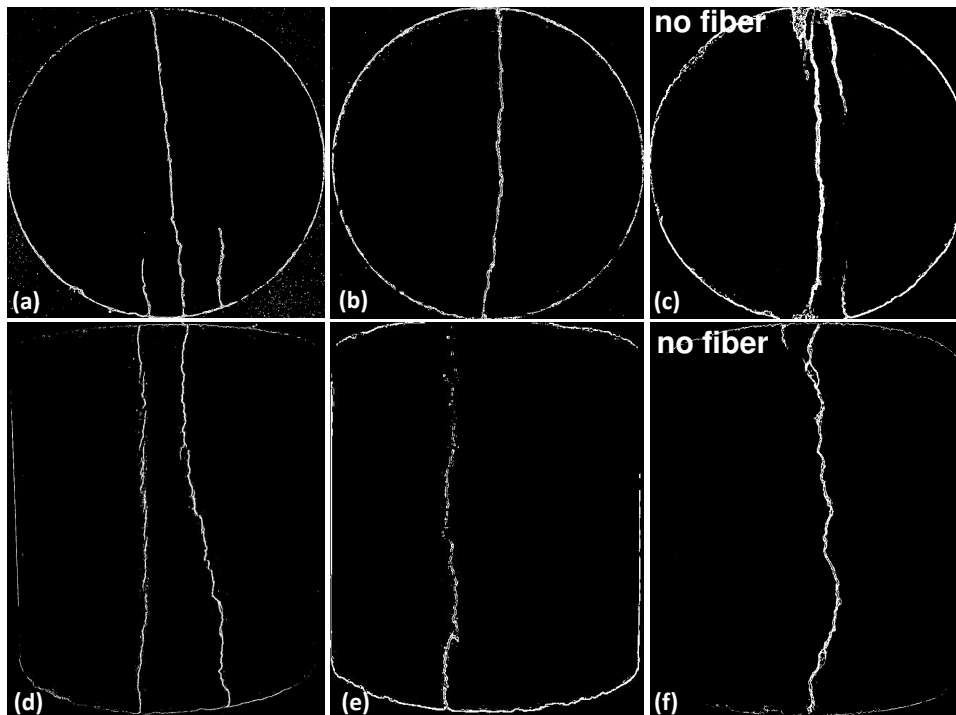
Binary images of specimens with discrete cracks; (a - c) top view of cracked specimens and (d - f) side view of cracked specimens.
